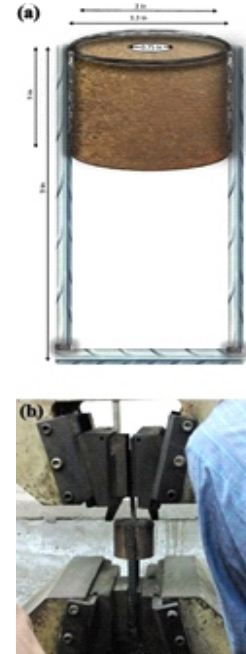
(a) Schematic diagram of pull out insert (b) steel reinforced concrete specimen during pull out test
